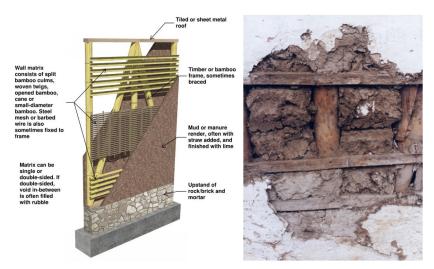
Traditional bahareque in Latin America: (L) structure; (R) wall detail (Lopez, 2016).
